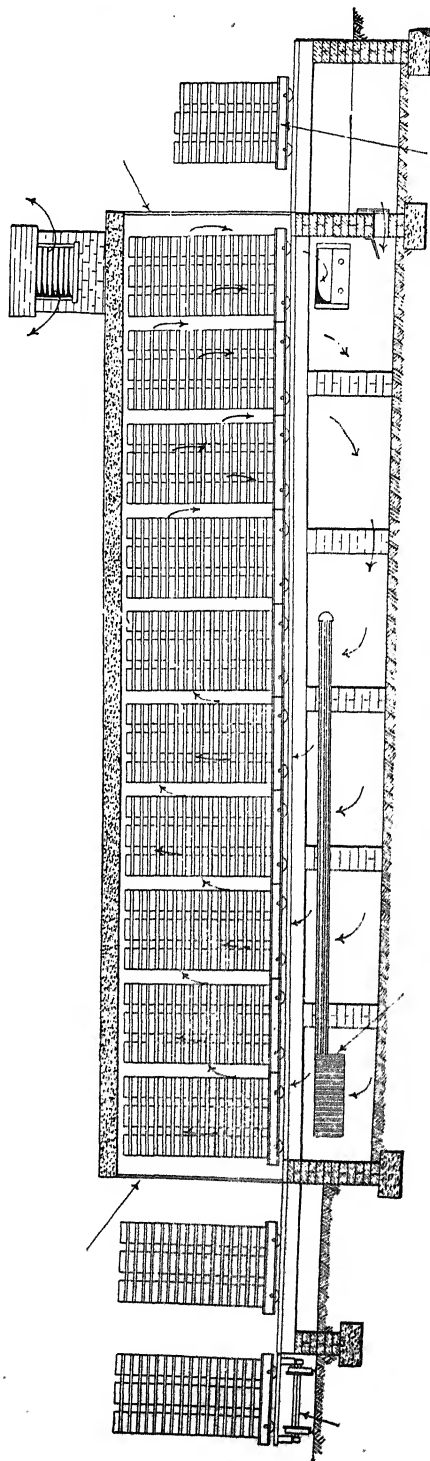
Erith's Progressive Dryer for hardwoods. Longitudinal section, showing details of construction.
